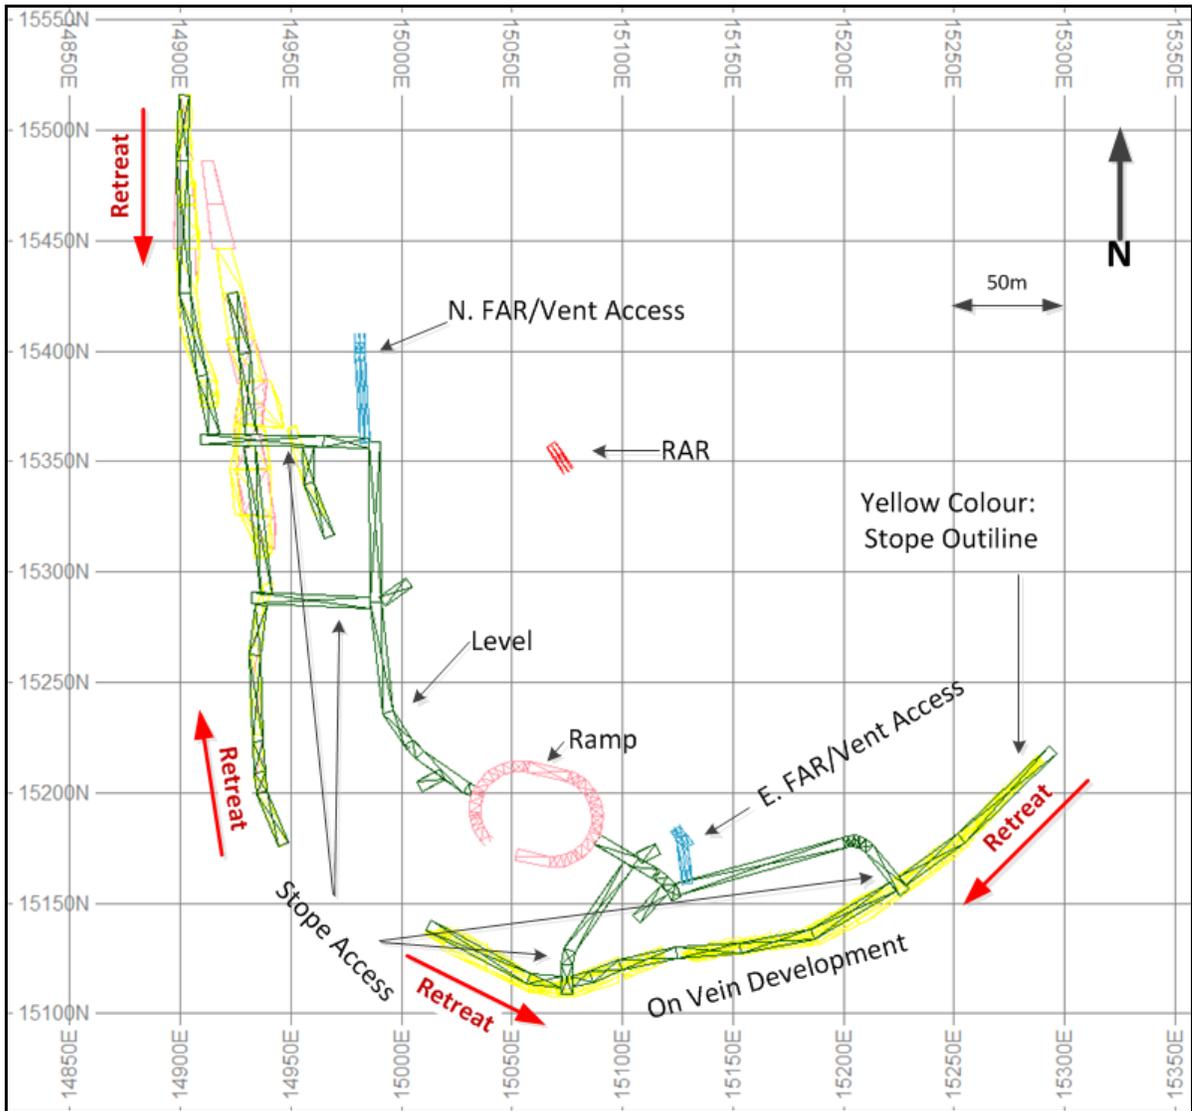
Plan View of 2060 Level Sub 2 (2080 mEL)
